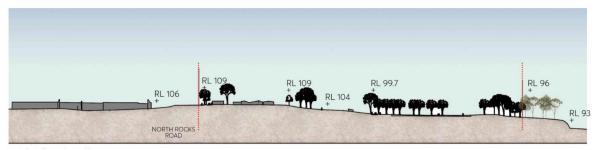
Cross-section showing local terrain with the subject site and adjacent shopping centre
